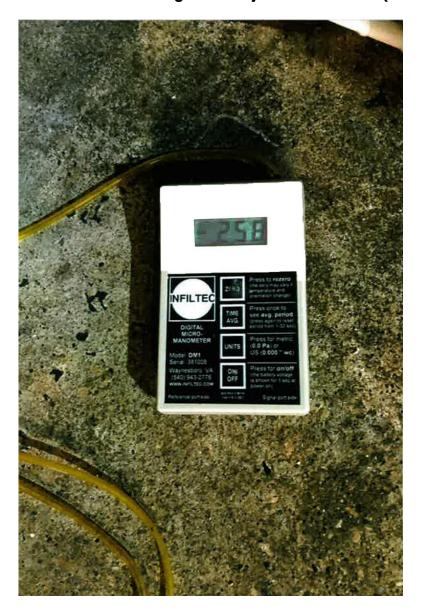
Sub-slab vacuum observation point VOP-1.
